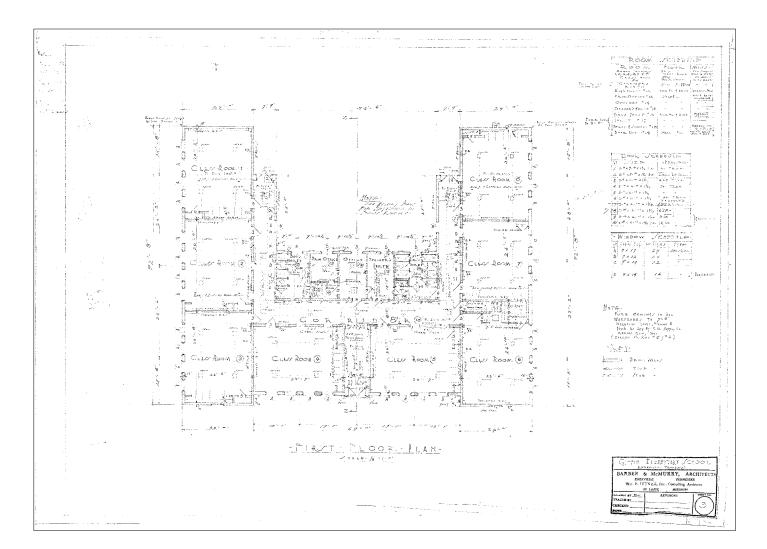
Ground Floor Plan – 1928 portion, Barber McMurry Architects.
